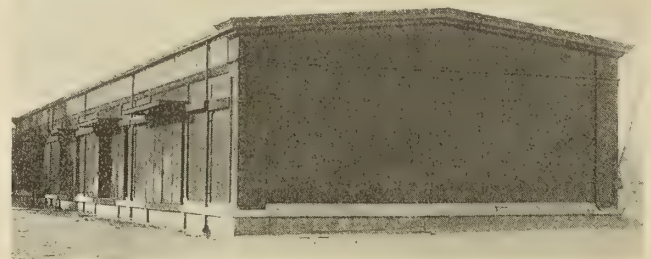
North and Shore Side of a Small Steel Shed. The Frame Is of Structural Steel with Galvanized and Painted Sides and Ends. In Front, the Floor of the Shed Is Flush with Pavement. The Foundation Is of Concrete
